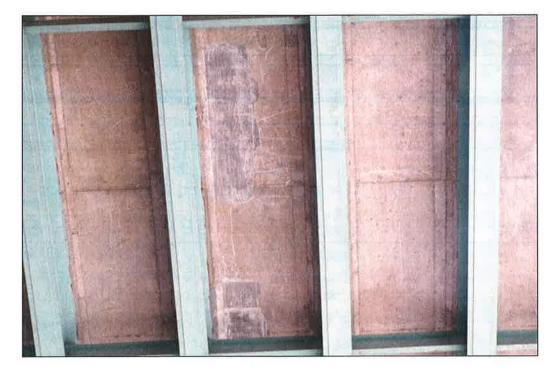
Typical Condition of Soffit (Bent 91-92) (fair condition – stained and unstained cracking, delaminations, isolated spalls, patches, wet areas and light scaling)
